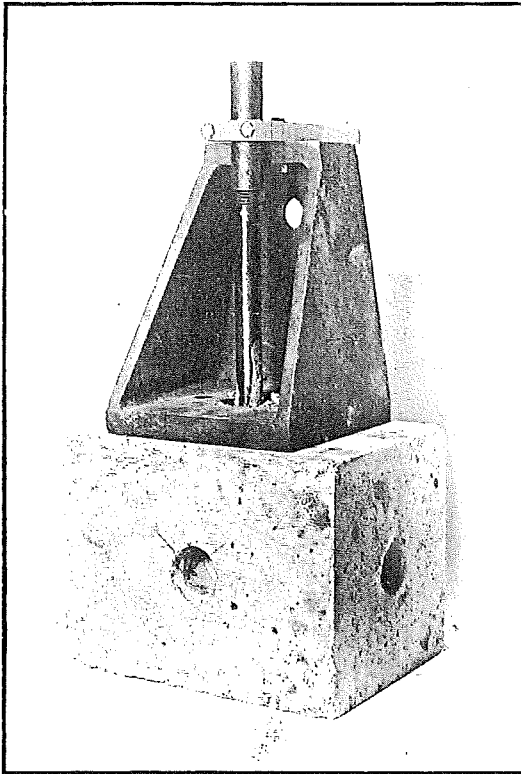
Typical fixture for alignment of bolts perpendicular to block face.
